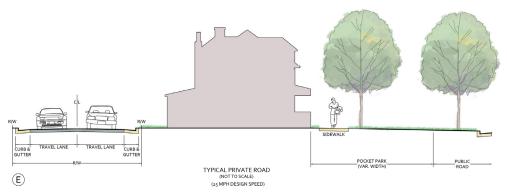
Private Street Cross Section for Amenity Oriented Lots
